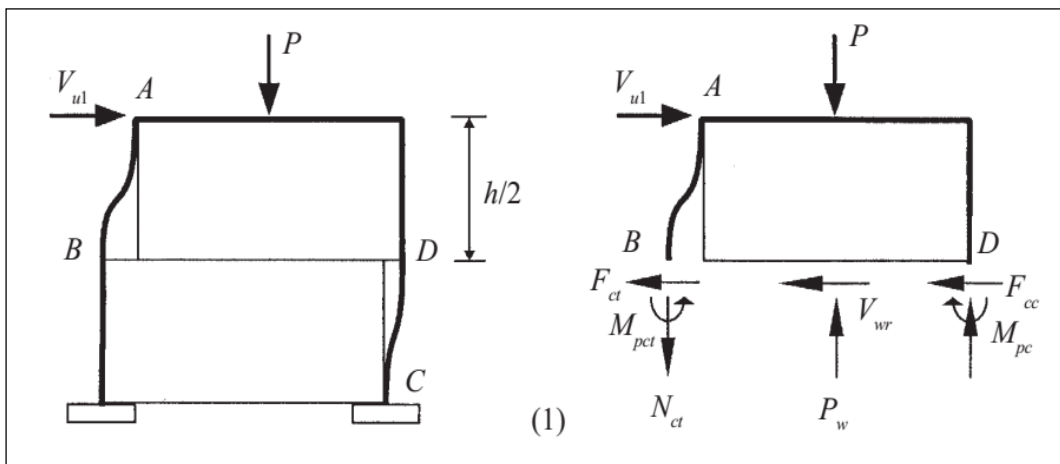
Failure mechanism 1 (Mehrabi & Shing, Seismic Analysis of Masonry-Infilled Reinforced Concrete Frames, 2003)
